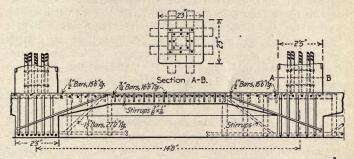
Raft Foundation for Warehouse, Newcastle-on-Tyne, England.
